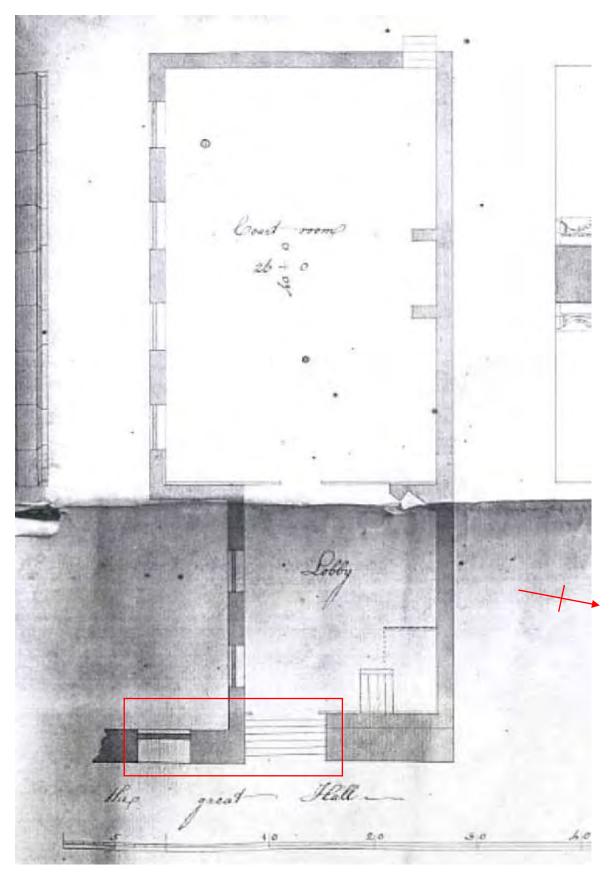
Agreed plans for Enlargement of the Court Room, Robinson, 1757 (detail). Note the larger, 8-foot opening between Anteroom and Hall. The 5-foot pier of brickwork between (now Cranmer) window and doorway still remains in situ. (Highlighted). There is no reason to assume that this work did not take place, though no material evidence is readily apparent (TSC/1/G/06/04/01/02).
